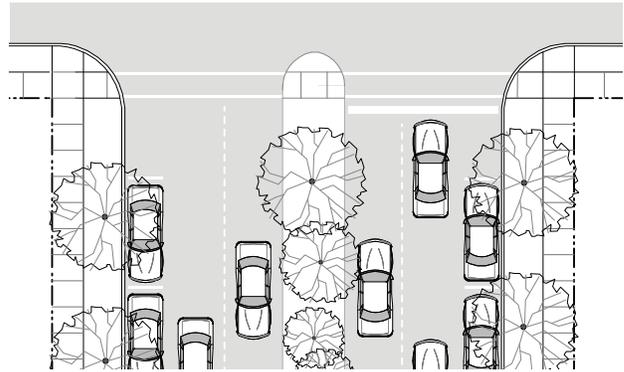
(2). Wide Street Crossing with Pedestrian Refuge Median.
